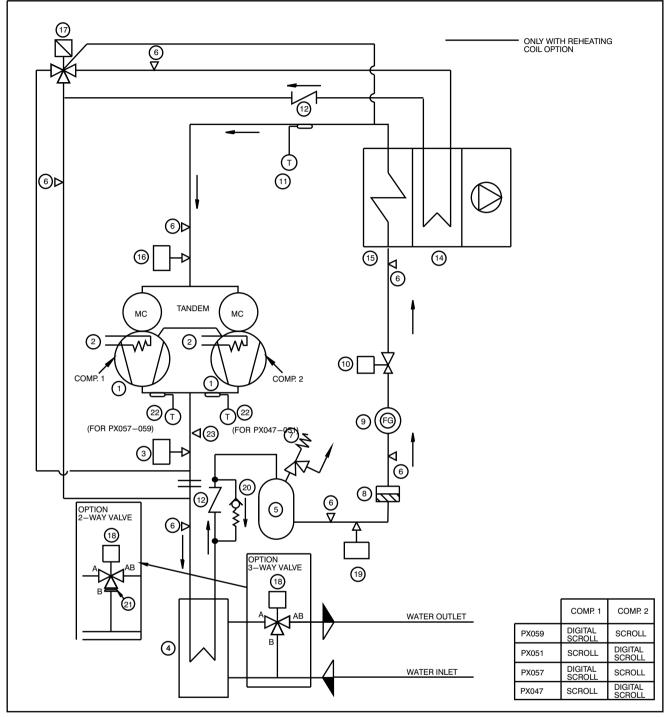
Refrigerant circuit W version - Single circuit - Tandem SCROLL compressors - EEV
